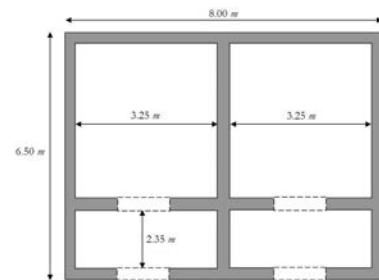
Typical plan shape (of ground floor) of a two-unit building being vertically separated.
